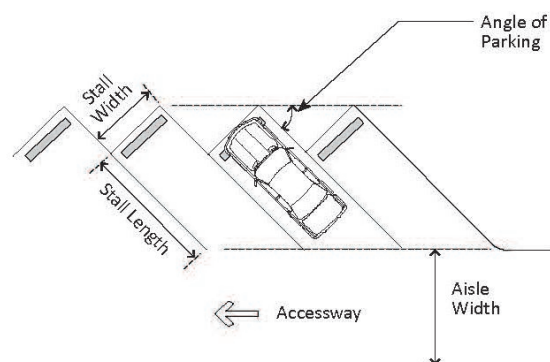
C: PARKING SPACE AND DRIVE AISLE DIMENSIONS
